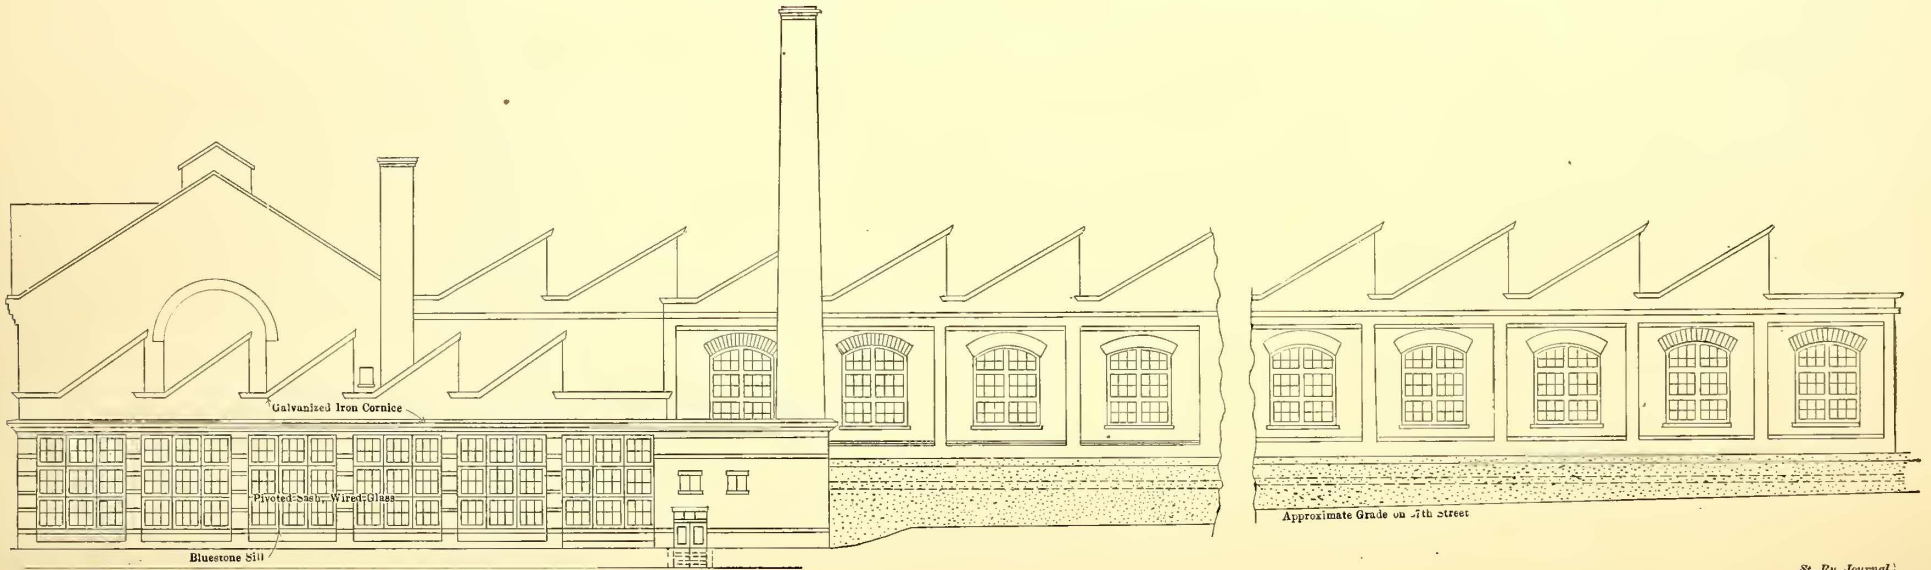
LONGITUDINAL ELEVATION OF THE THIRTY-SIXTH STREET INSTALLATION, SHOWING THE OFFICE BUILDING AND INSPECTION STRUCTURES
